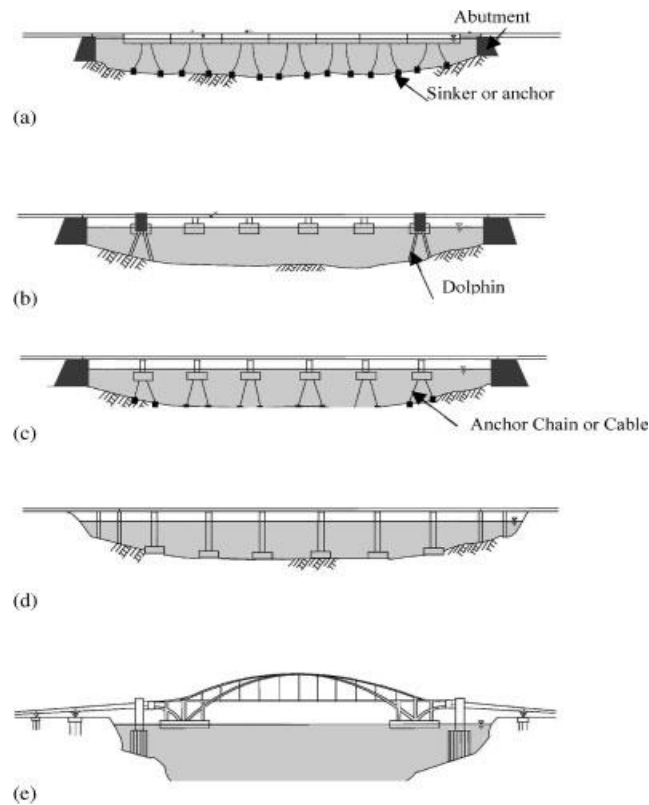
Floating Bridge: (a) continuous pontoon bridge; (b) separated pontoon bridge; (c) semi-submerged foundation; (d) bridges with gravity foundation; (e) long-spanned separated foundation [3]
